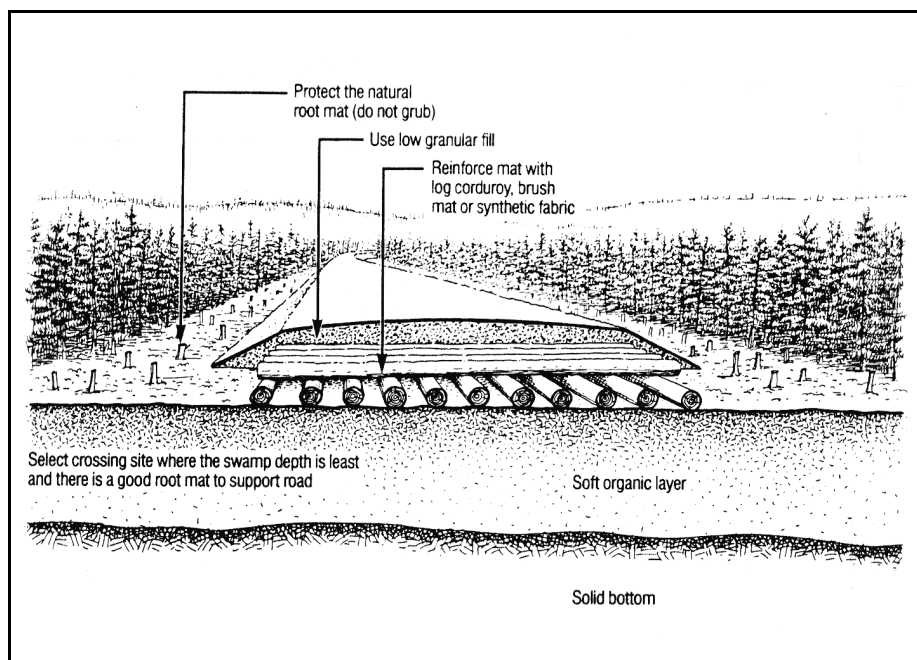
Elements of a road crossing through a swamp wetland, cross section (Ontario MNR, 1990).
